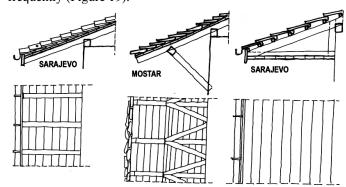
Some types of roof eaves of town houses in Sarajevo and Mostar Source: Author (Drowings, 1984)
